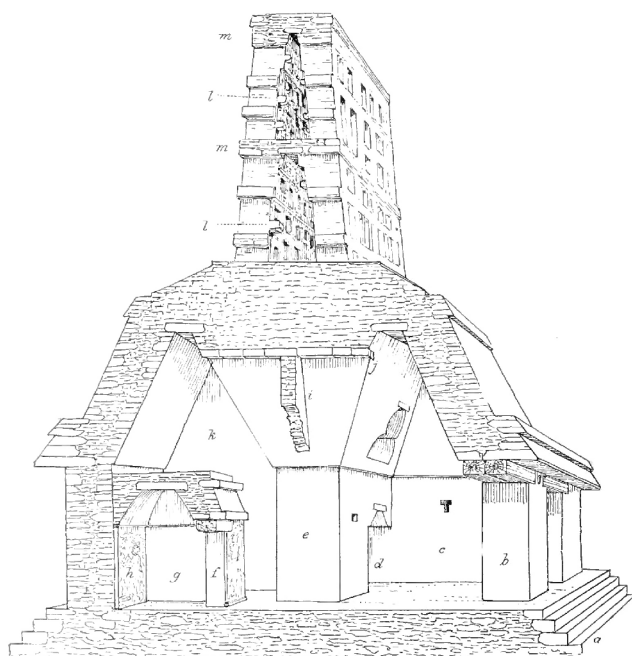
TRANSVERSE SECTION THROUGH MIDDLE OF TEMPLE OF THE CROSS, SHOWING PERSPECTIVE OF EAST HALF OF BUILDING.
